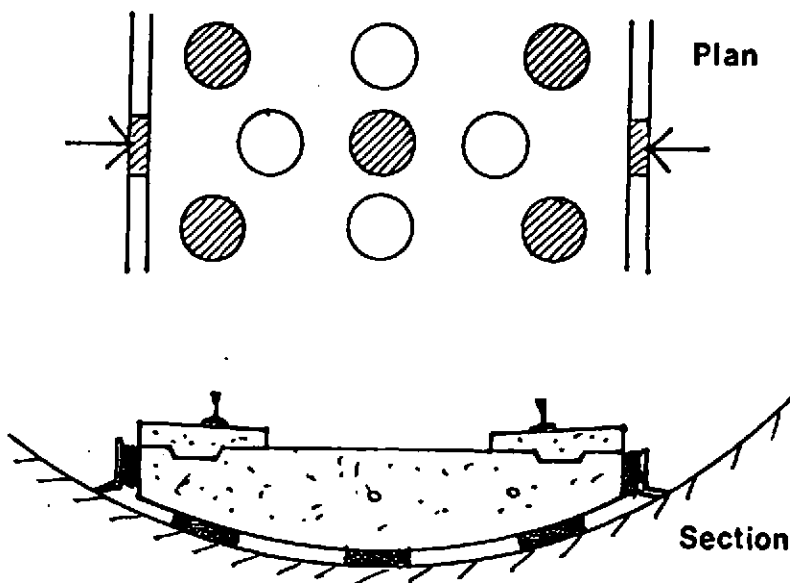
CROSS SECTION AND PART PLAN OF ISOLATED TRACK SLAB.
